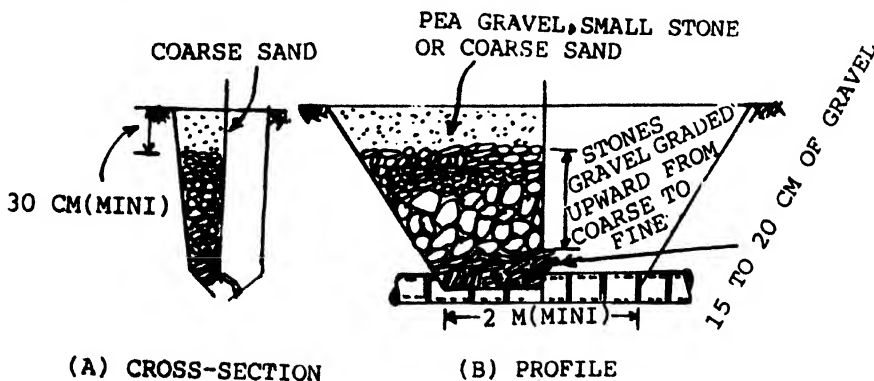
BLIND INLET ON PIPE DRAIN
